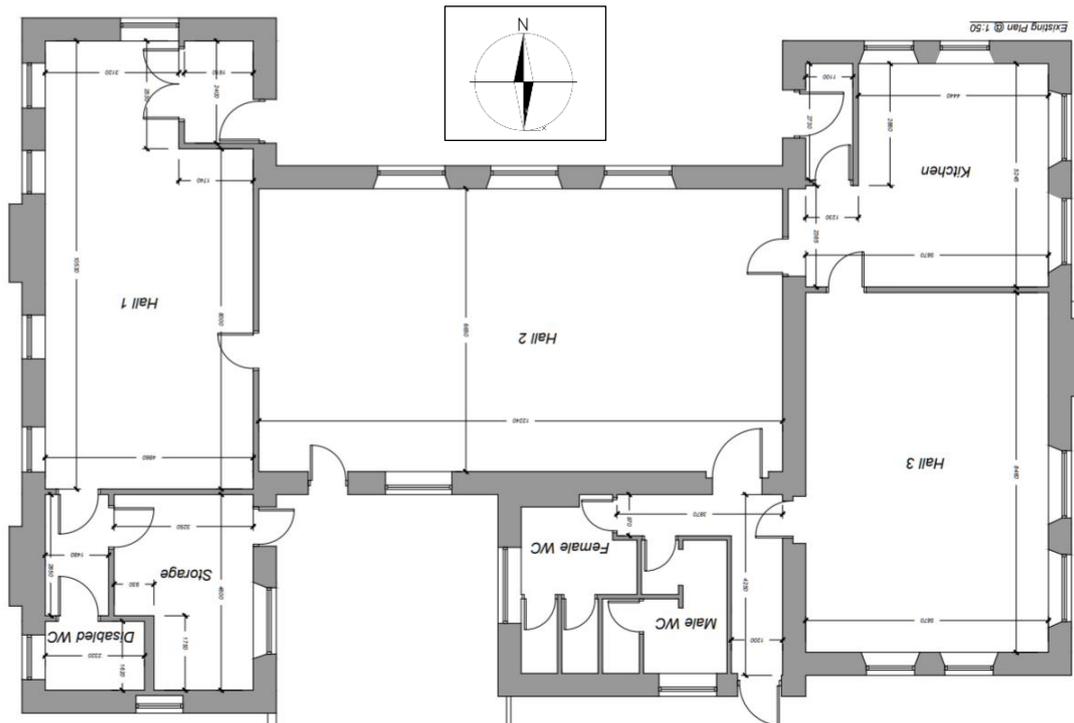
Stoney Stanton Village Hall Layout 1:50 scale
